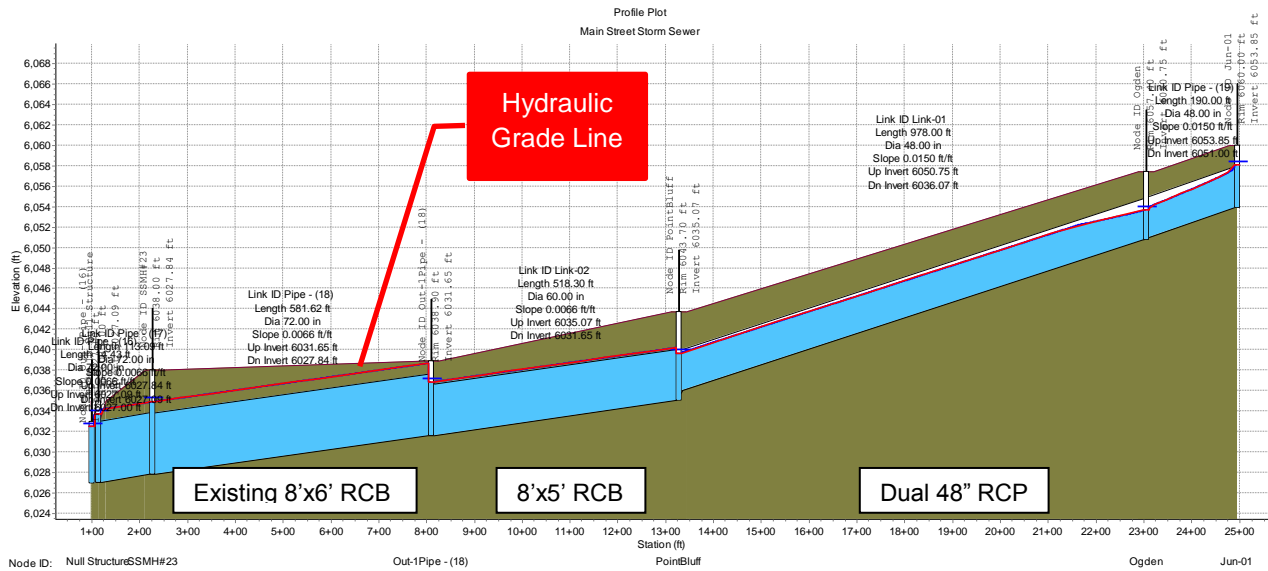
Design profile for storm sewer trunline (replacing existing drainage ditch).
